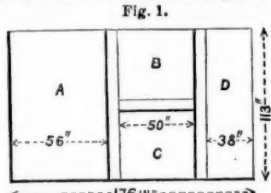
represents a shaft in the Mansfeld district. The dimensions are given in inches. A is the pumping shaft, B the shaft for the man engine, C the ladder shaft, and D the winding shaft.
